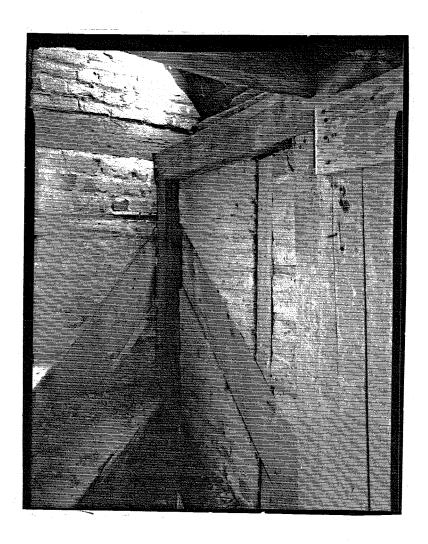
Hermitage Quarter, detail of corner bracing in staircase looking southwest.
